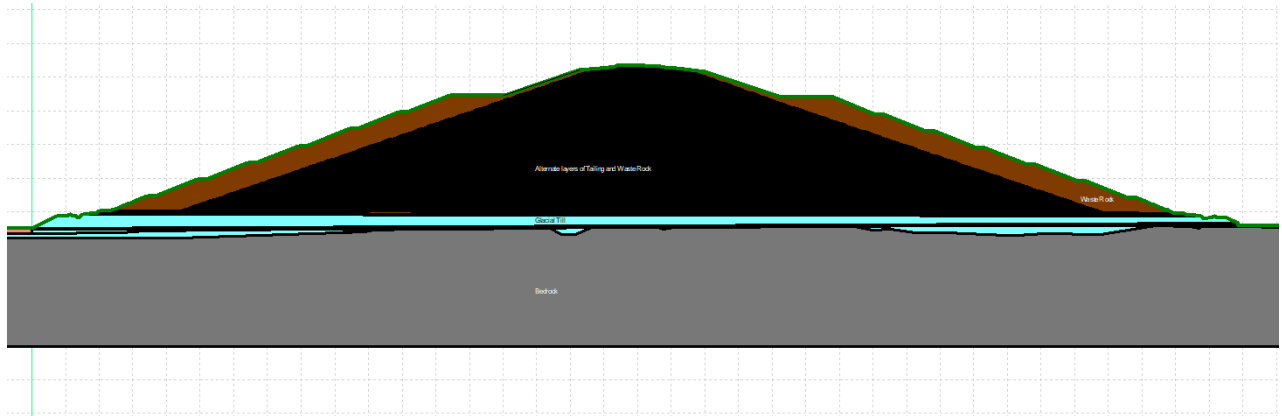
Cross Section of Co-Disposal Facility Along Section B-B Looking East
